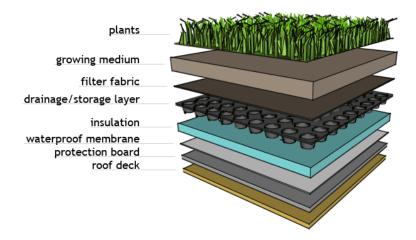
Layers of an Extensive Green Roof (My Rooff, 2017) 6.3 Analyses and Design for Green Roof on Gordon Library
